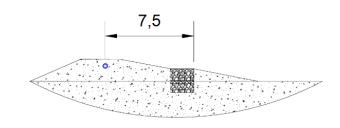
Provisional work schematic plan – Source: YPF SA
